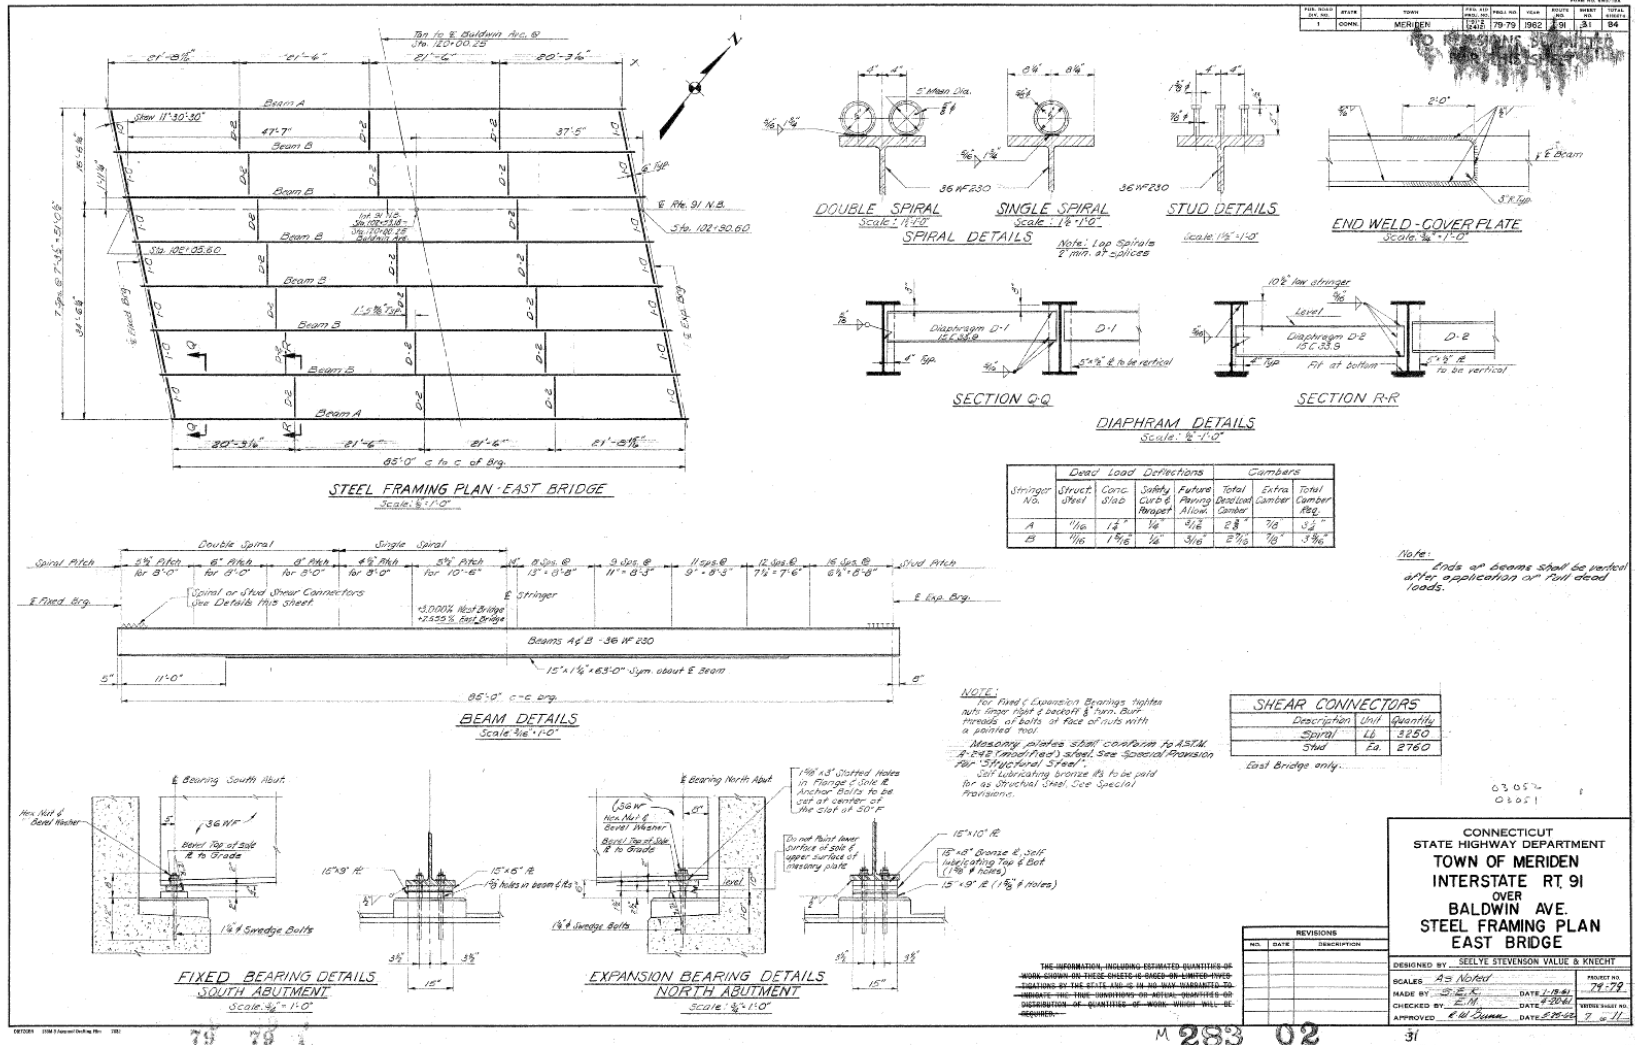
A drawing of the Meriden Bridge from Connecticut State Highway Department
